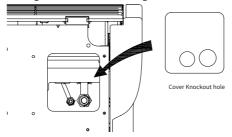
Electrical Wiring Connection for Indoor Unit
